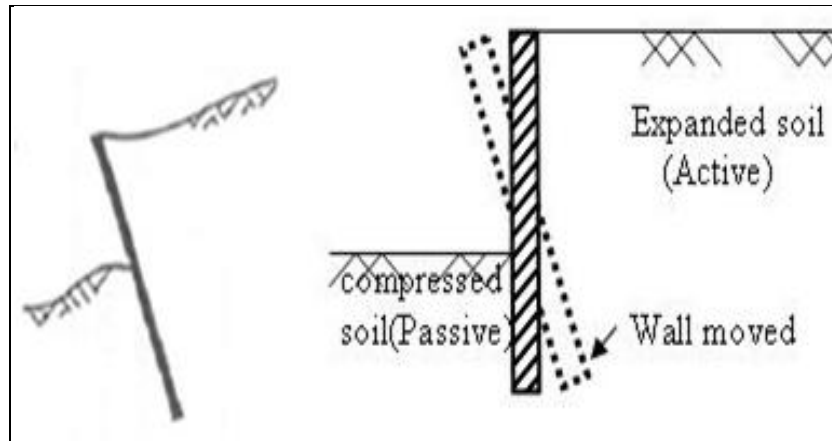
Cantilever wall failures by forward rotation [2]
